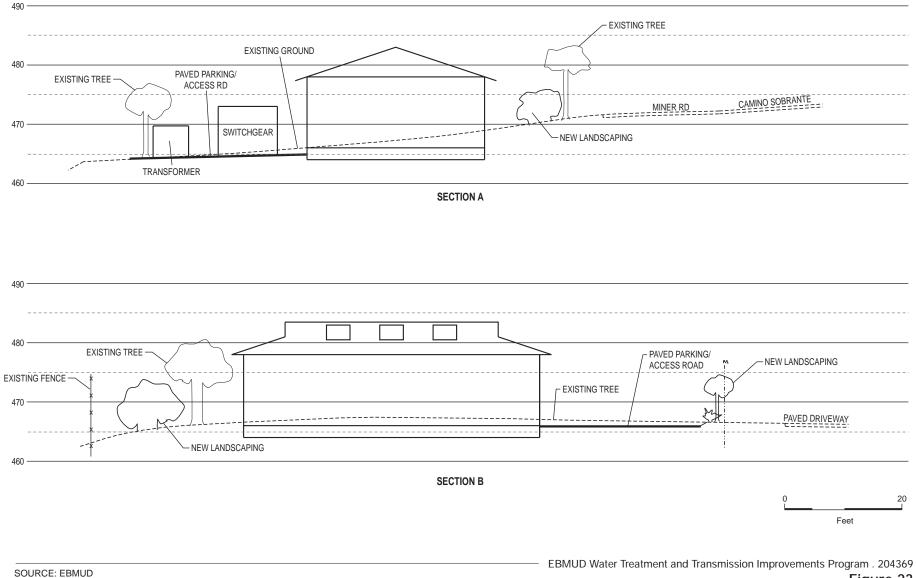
Happy Valley Pumping Plant Alternative Site-Cross-Section
